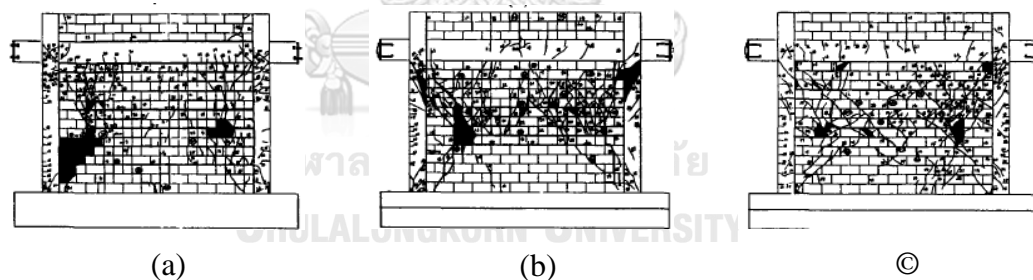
Damage Patterns Mehrabi Armin et al. (1996), (a) Sliding of Bed Joints, (b) Shear Failure Columns, (c) Corner Crushing
